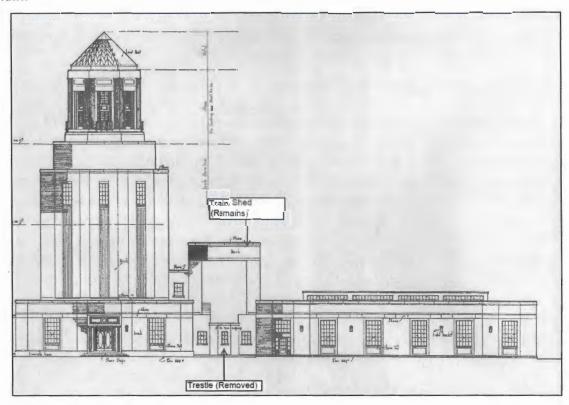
, "Preliminary Treatment Works - West Elevation" Drawing 62, Bid Package No. 29; C.F. Owsley, Consulting Architect, April, 1930 (partial view)
